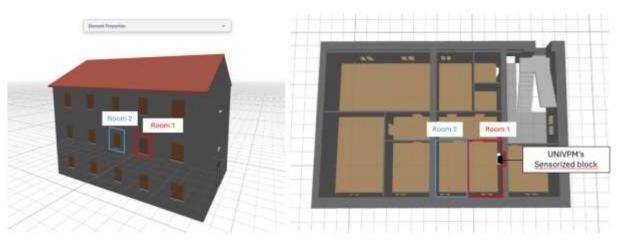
Layout of the two twin rooms on the 1st floor of the Carmelitane building, used for testing
